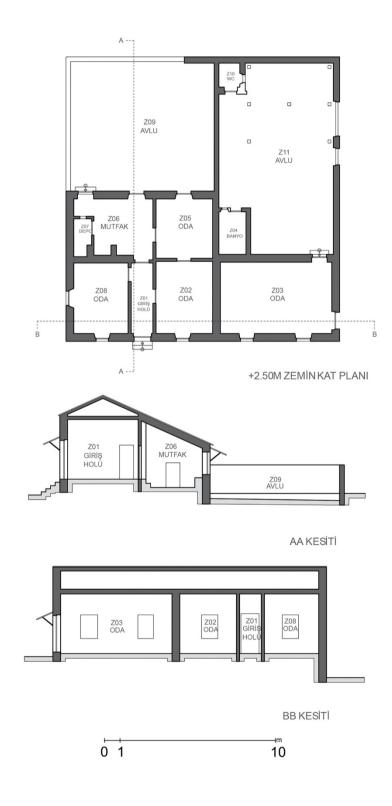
Plan of Bunkhouse (Sinan, 2019)
